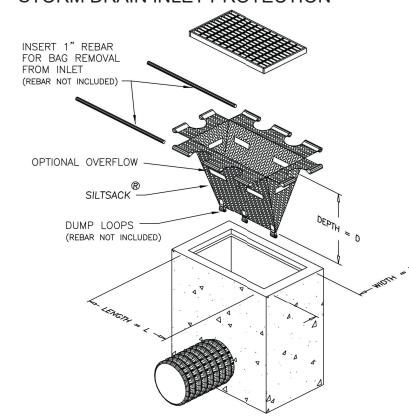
## DETAIL FOR STREET CB SILT PROTECTION SCALE: NTS
